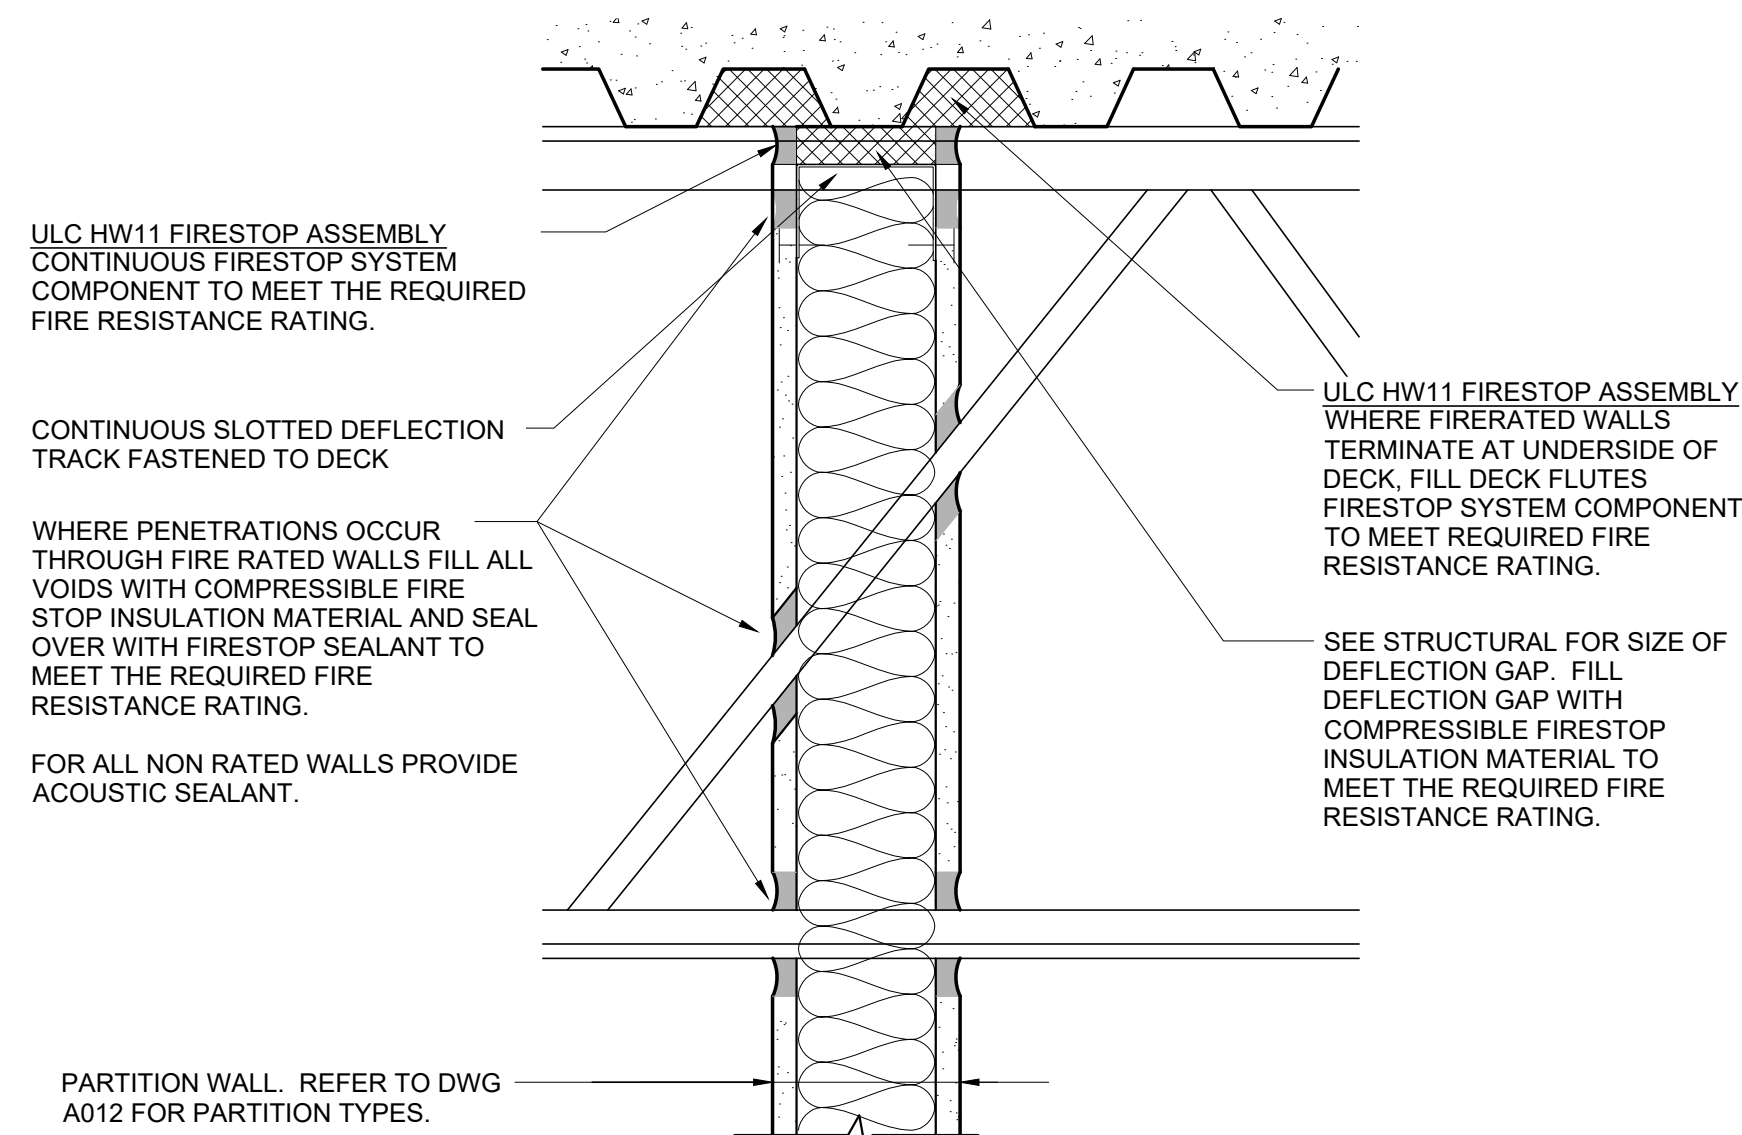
FIGURE D: GYPSUM BOARD PARTITION AT OPEN WEB STEEL JOIST AT FIRE RATED GYPSUM PARTITION: FIRESTOP SYSTEM NO. HW11
